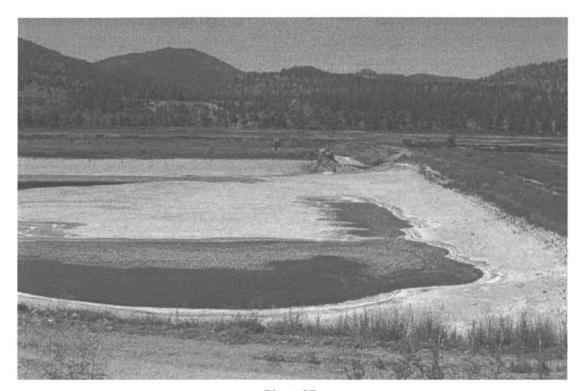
Pond 8 (Emergency spill pond) showing breach in northwest corner, looking west. 06/22/11
